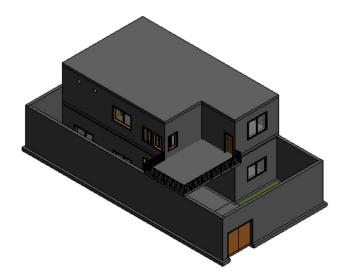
3D view of Concrete Insulated Sandwich Panel Building
